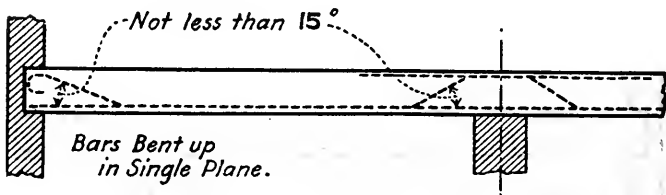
Typical Reinforced Concrete Beam; Principal Longitudinal Bars Bent Up in Single Plane
